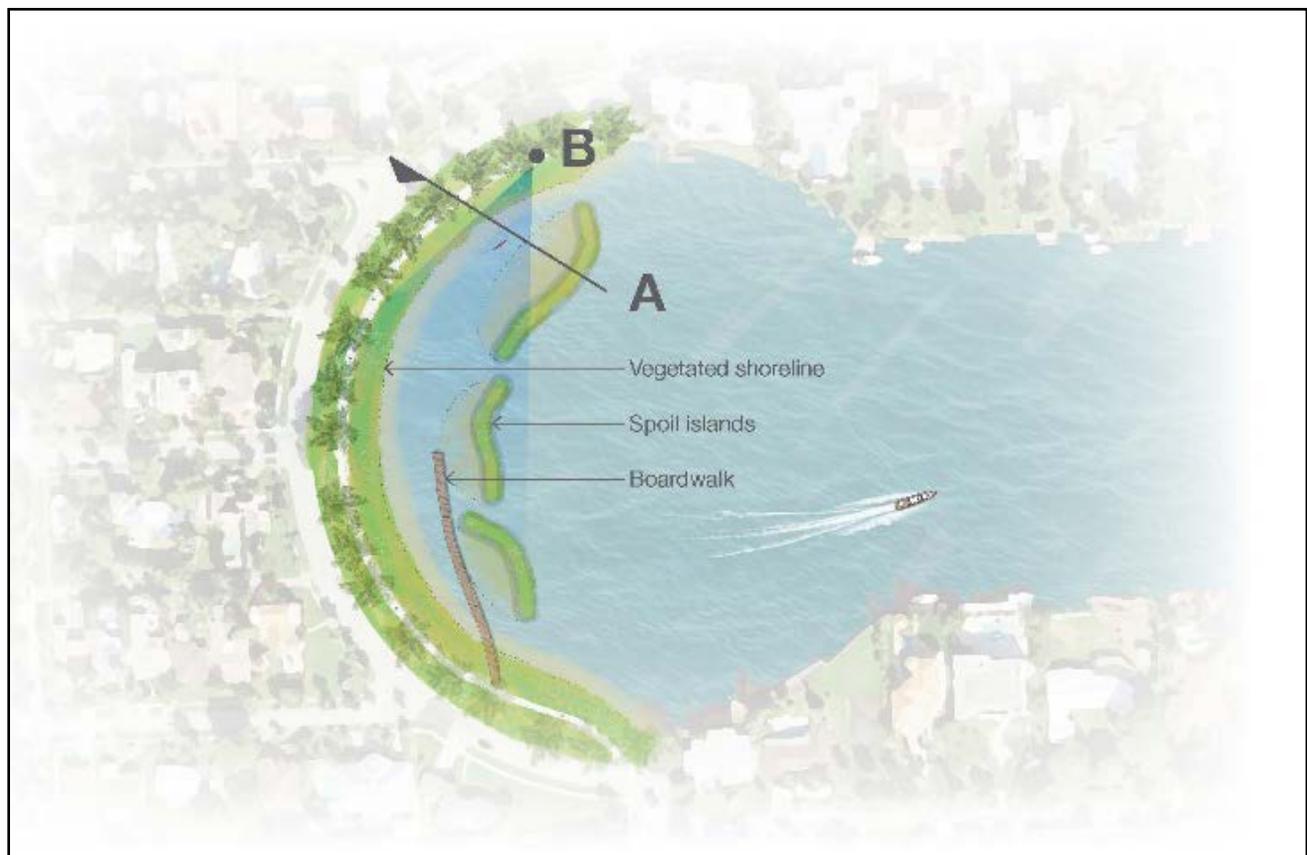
Shallow Water, High Wake - Plan View showing the vegetated shoreline, spoil islands and added boardwalk amenity.
